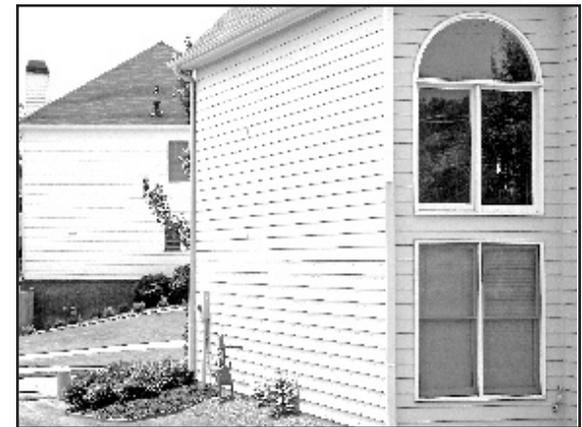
"Blank facades" are facades with no windows, doors, or architectural treatments. These facades are not permitted in the district.
